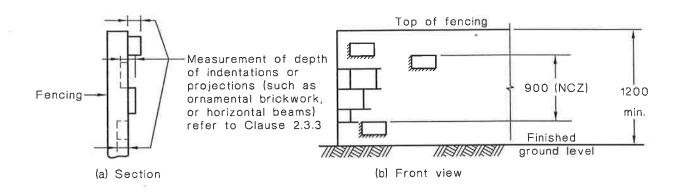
(in part) PERPENDICULAR FENCING DIMENSIONS
